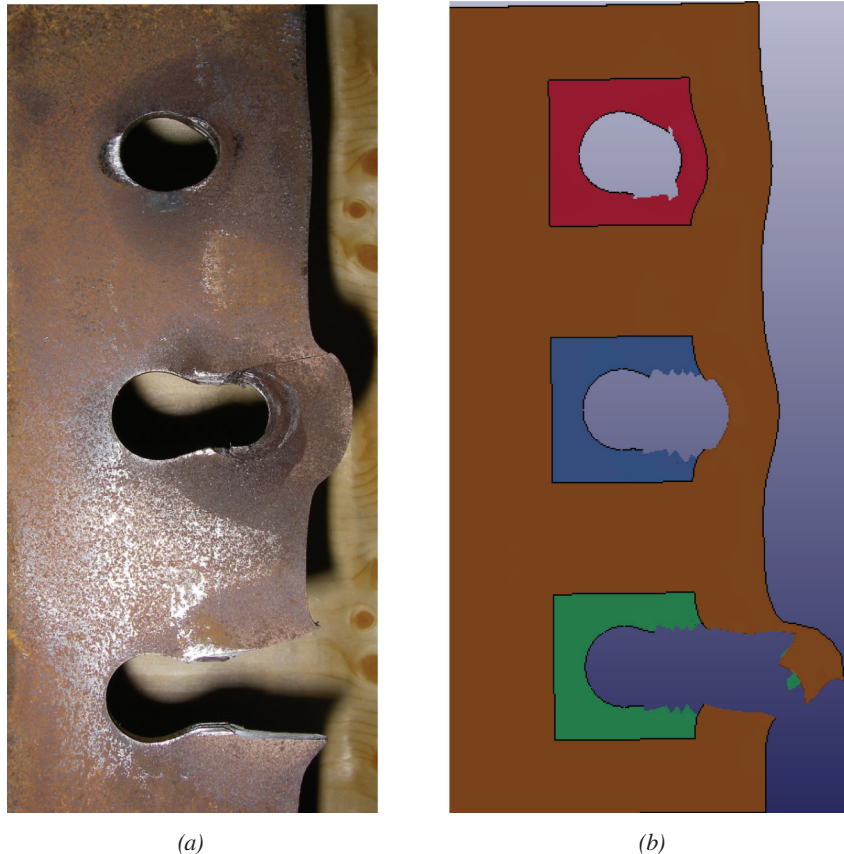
Failure of connection details due to high strain rates: (a) actual connection plate; (b) connection detail model (photographs courtesy of Professor Ian Burgess).
